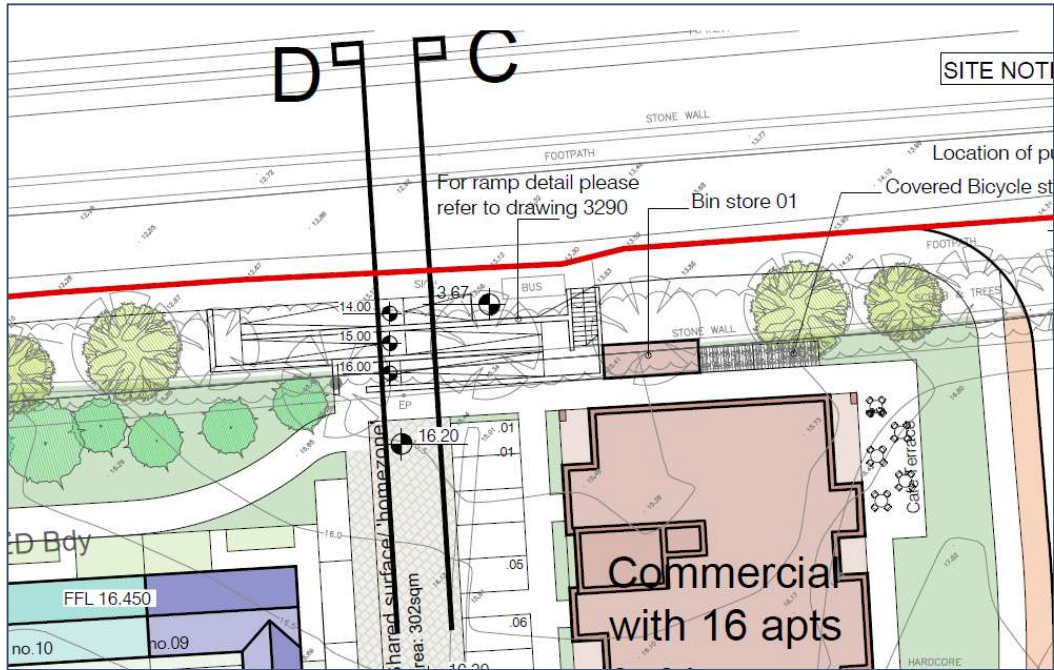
Ramp detail as shown on Stage 2 drawings (extract from drawing 18128-3004)
